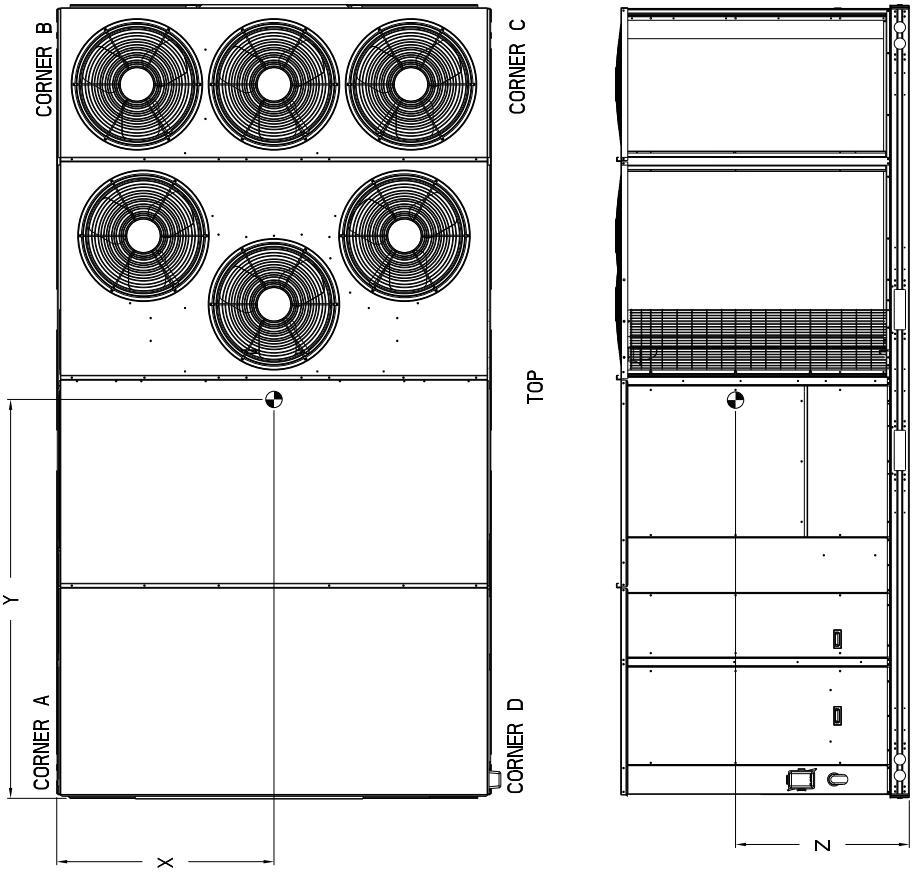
(cont.) - Unit Dimensional Drawing - 24 and 26 Size Units, Sheet 2 of 3
